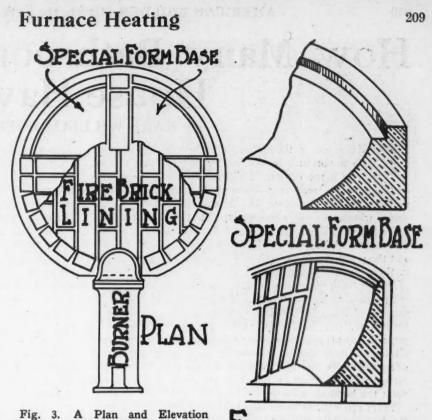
A Plan and Elevation Showing, in Detail, the Construction of the Fire Pot Lining.
